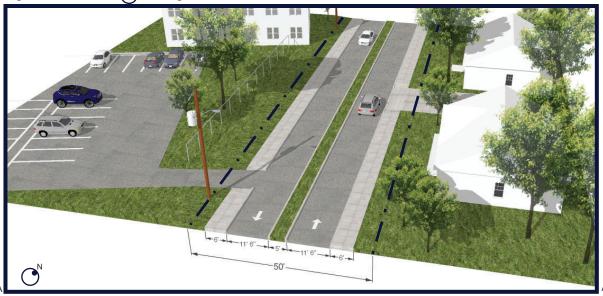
illustrates the existing conditions of Hood Avenue. The roadway has a 50' R.O.W. comprised of two 11'-6"-wide travel lanes, a 5'-wide grass median, and 6'-wide sidewalks walks on both sides of the road.
